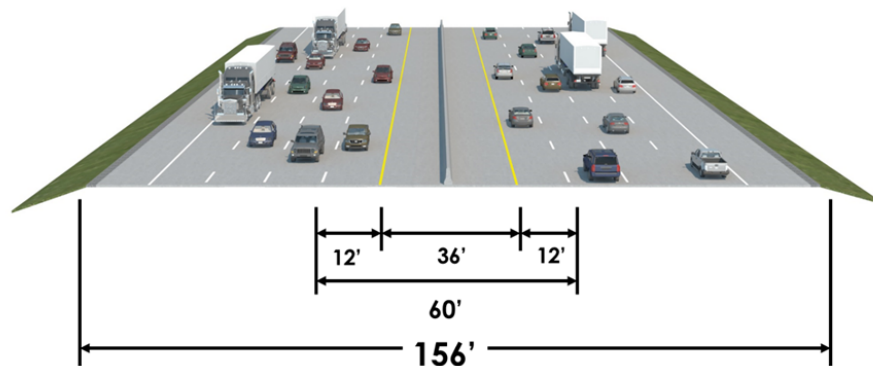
Proposed I-65 8-Lane Widening Typical Section Inside Existing Median
